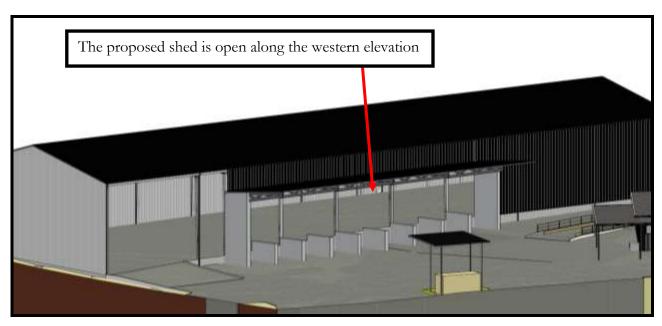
Proposed new shed (perspective) (Source: Insight Architecture, 21 March 2016)
